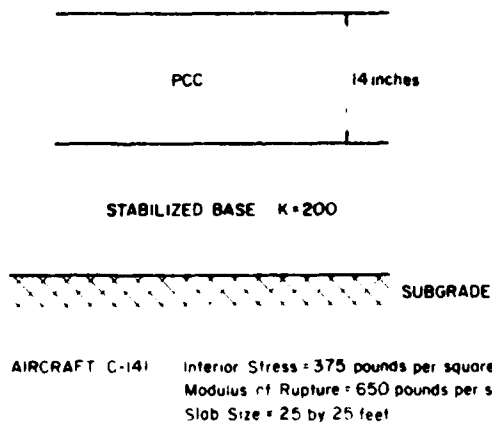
Pavement Structure Used in Concrete Example of CONOMR Module
